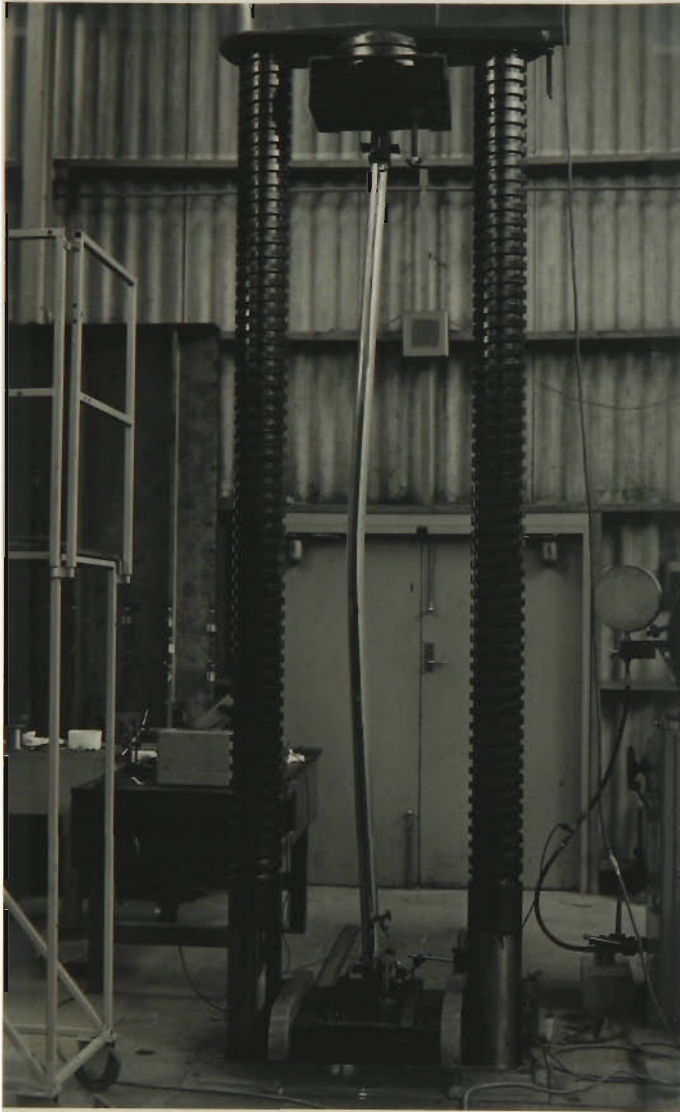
Mohr & Federhaf Universal Testing Machine
